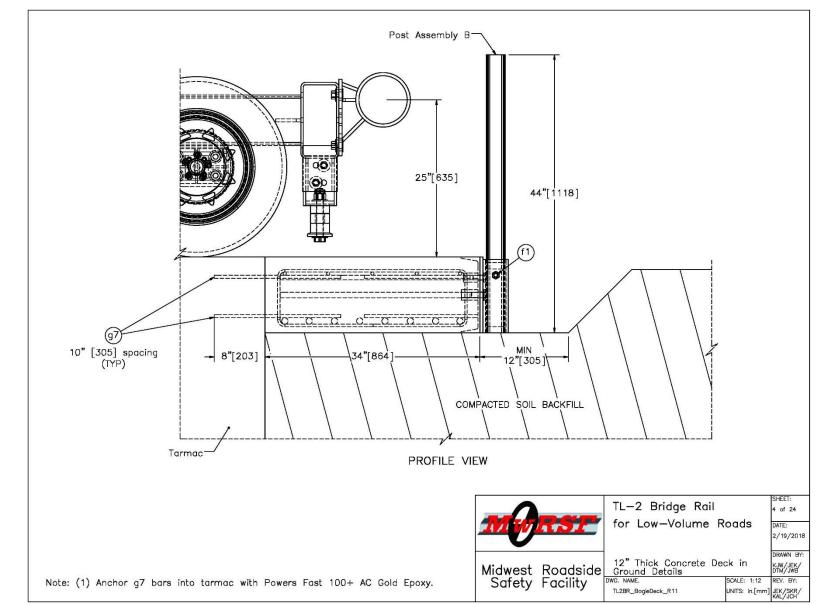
Bogie Testing Matrix and Setup, 12-in. Thick Concrete Deck in Ground Details
